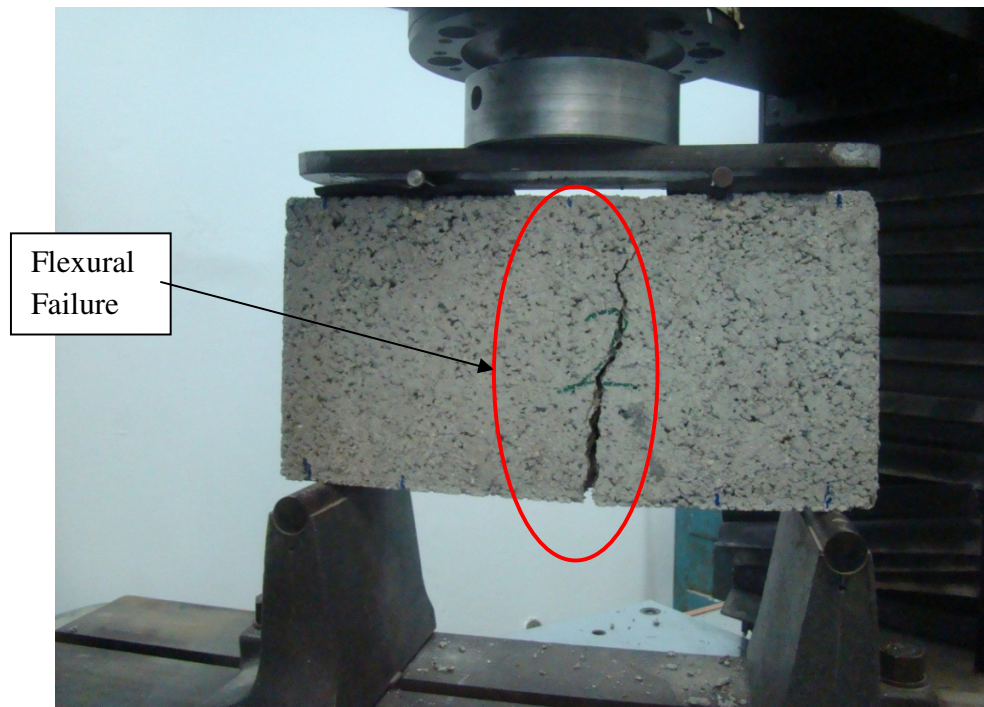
Flexural Test of Concrete Masonry Block (Specimen 2)
